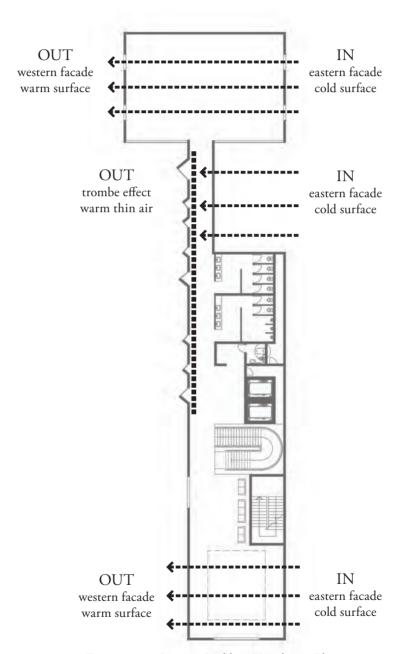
33 - Support Building Ventilation Plan (Source: Author. 2013)
